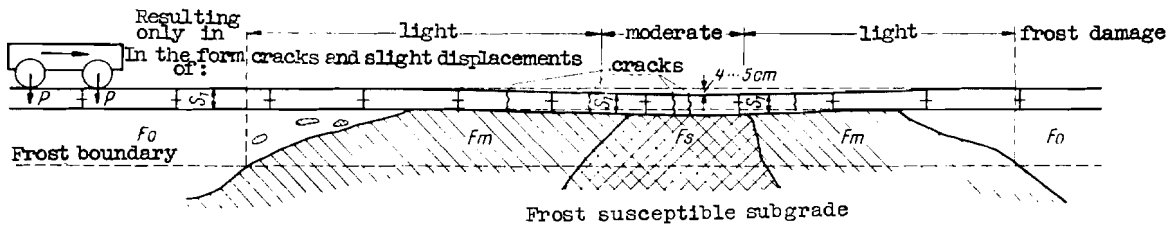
Thaw damage in a concrete pavement (dowelled and reinforced) over a softened subgrade of varying bearing strength. Full slab thickness S_1 is maintained throughout. Owing to their high bending strength the concrete slabs settle fairly uniformly in the softened subgrade. Only individual cracks and slight tiltings occur. Dowelling diminishes settlement (elastic chain of slabs).
